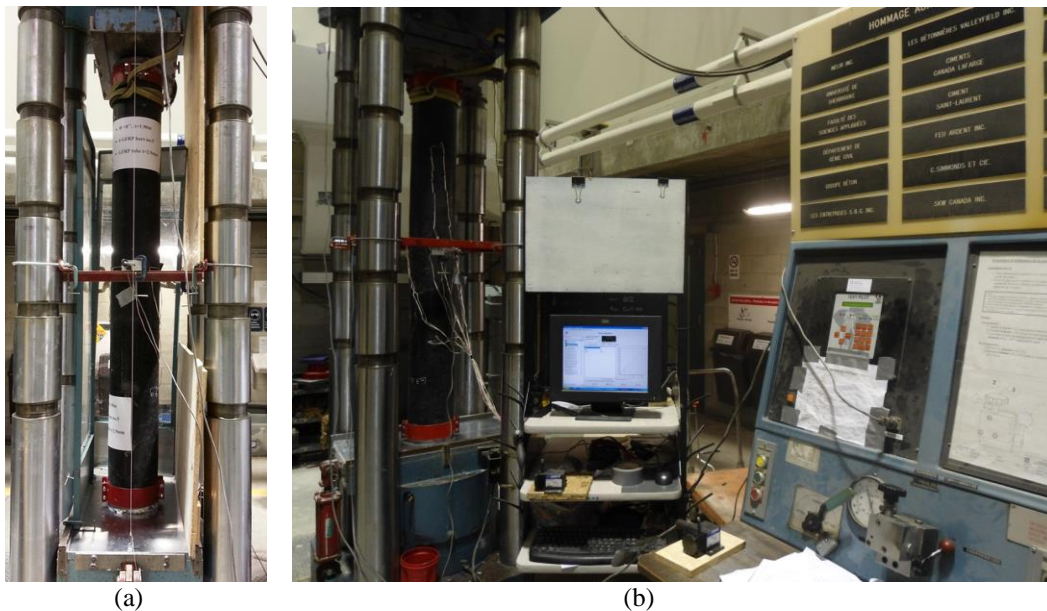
Test setup: (a) test specimen inside the testing machine; (b) a data acquisition system
